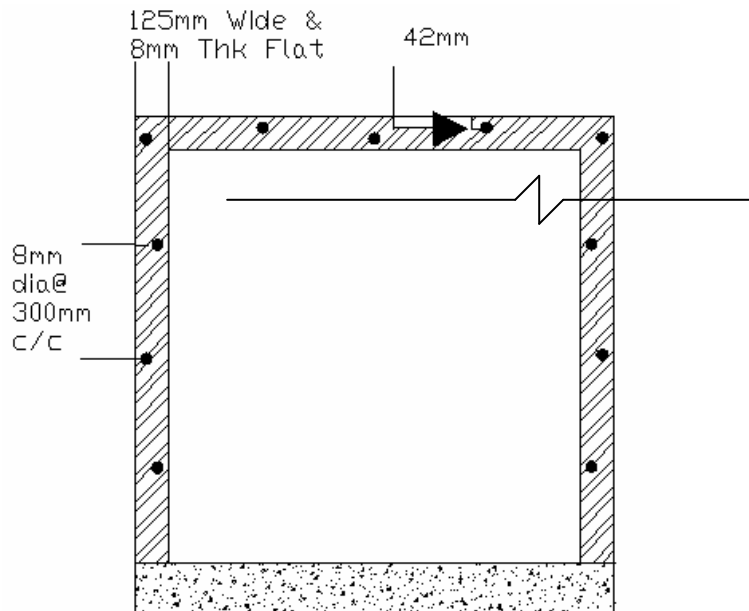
Arrangement of Flats at Door openings:-
